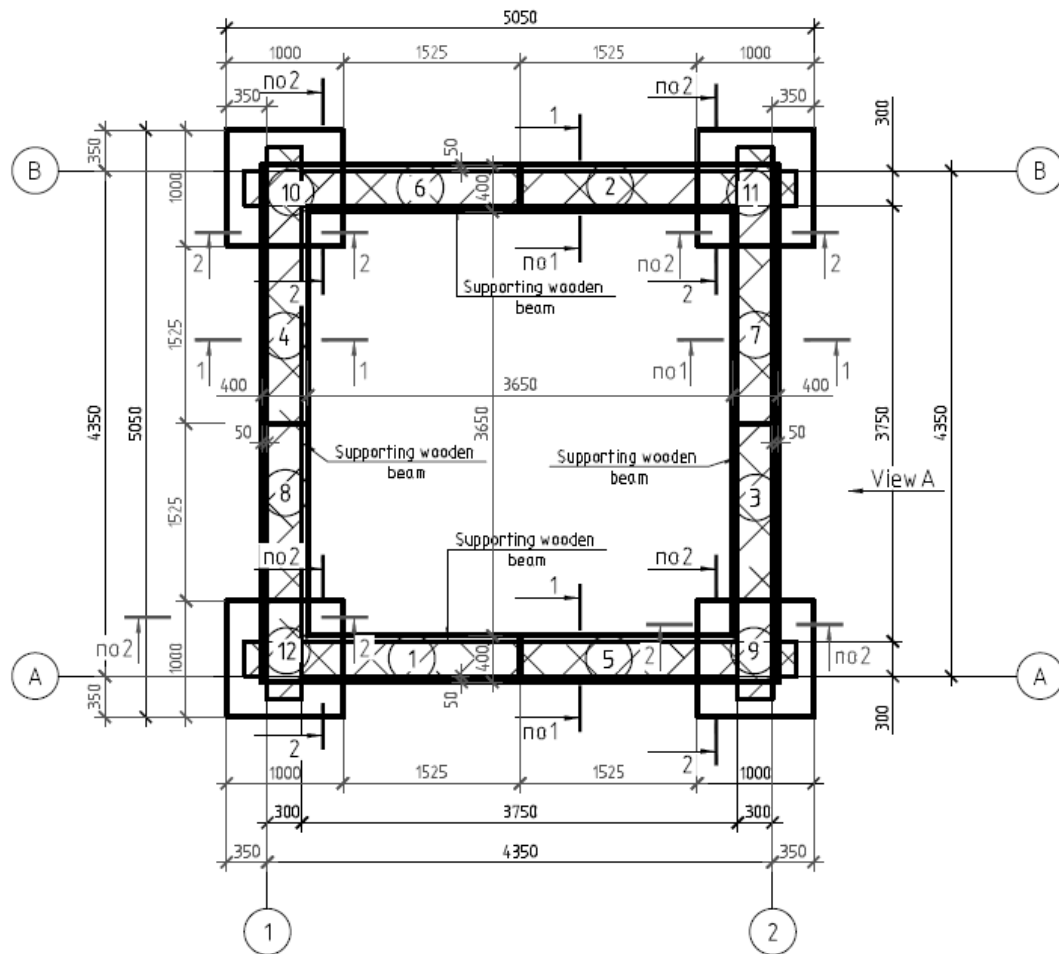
Scheme of strengthening the supporting wooden beams of the bell tower structure
